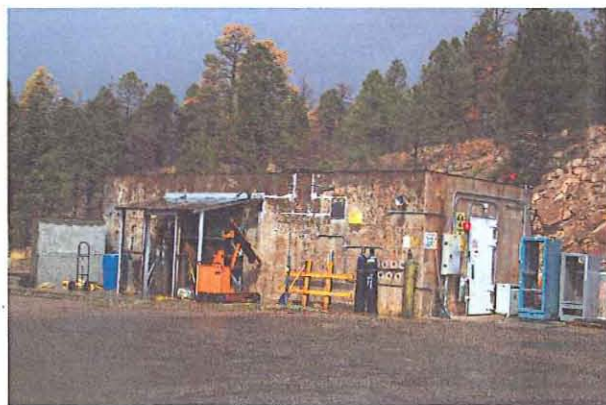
Oblique view of southeast and northeast sides of TA-40-4
